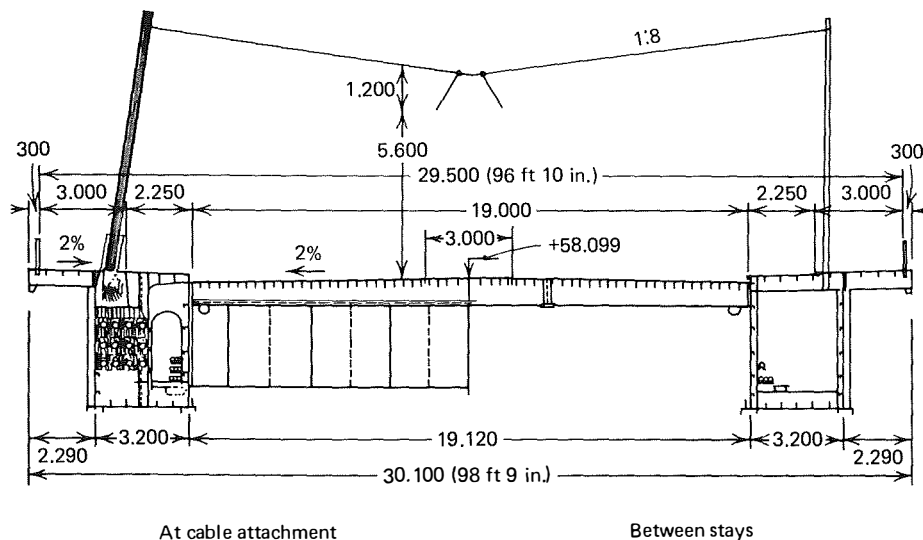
Severin Bridge, cross section. (Courtesy of Acier-Stahl Steel, reference 4.)
